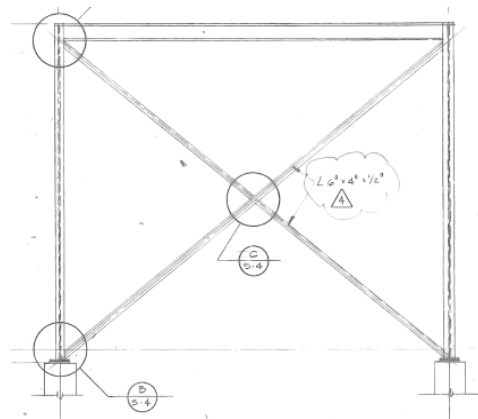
Frame Elevation (88UT1A--A-1516-1)
